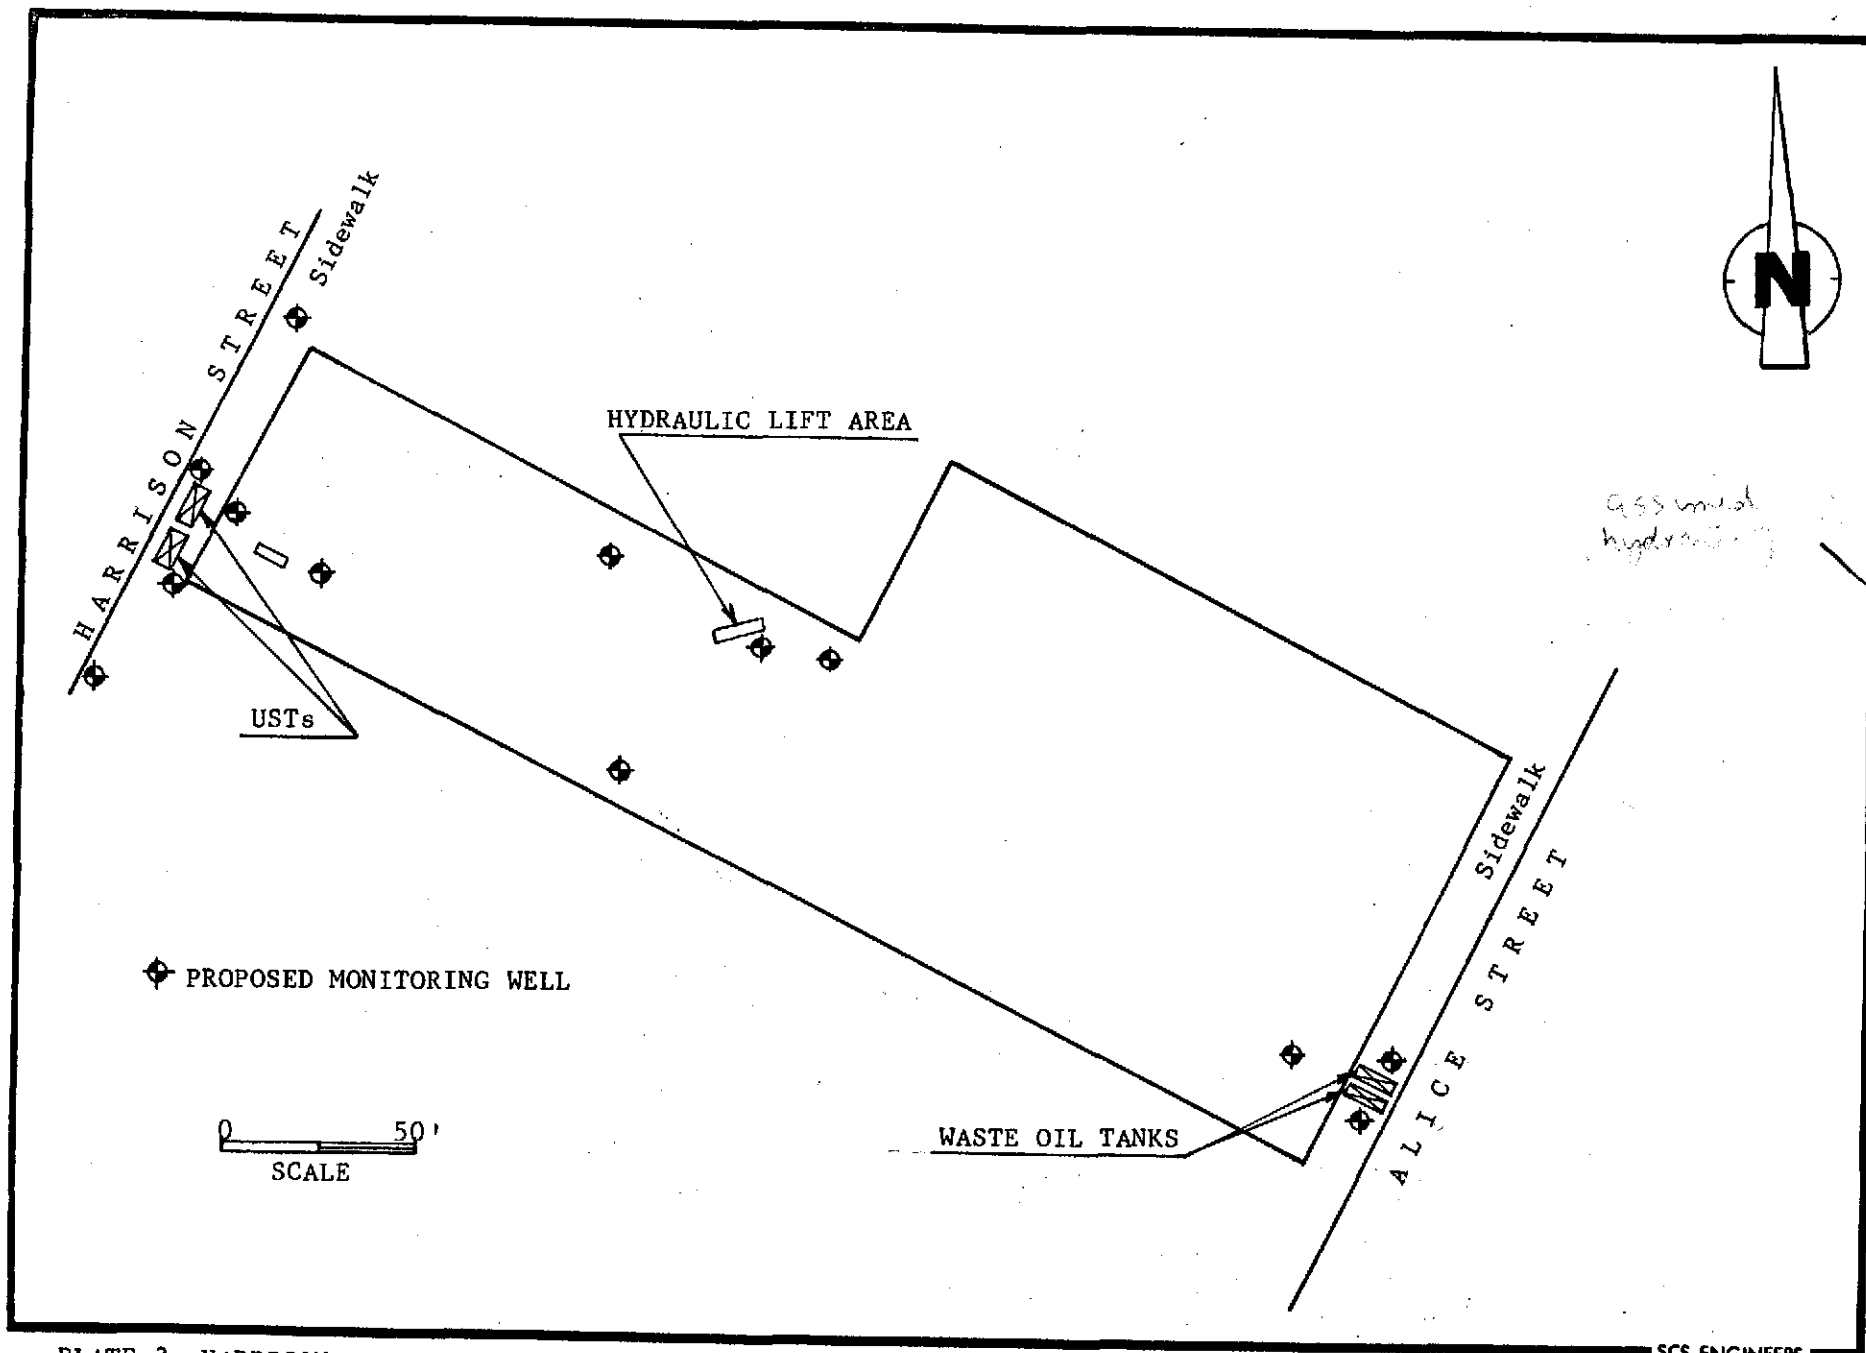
HARRISON STREET GARAGE-OAKLAND Site , Proposed Monitoring Wells
